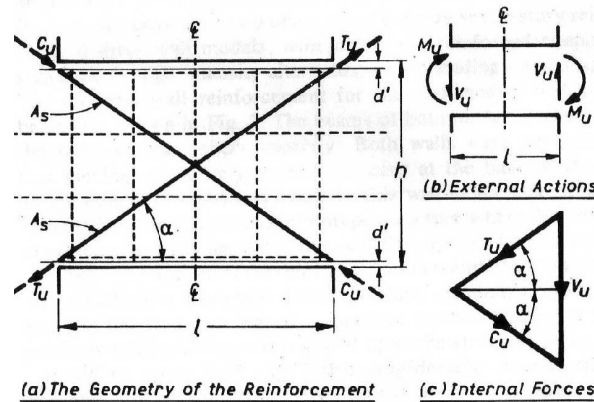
Diagonally reinforced coupling beam (Paulay and Santhakumar 1976)
